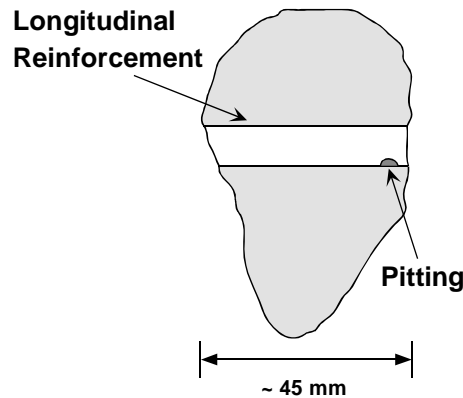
Reinforcing Bar Condition Away from Crack, Specimen 1.3
